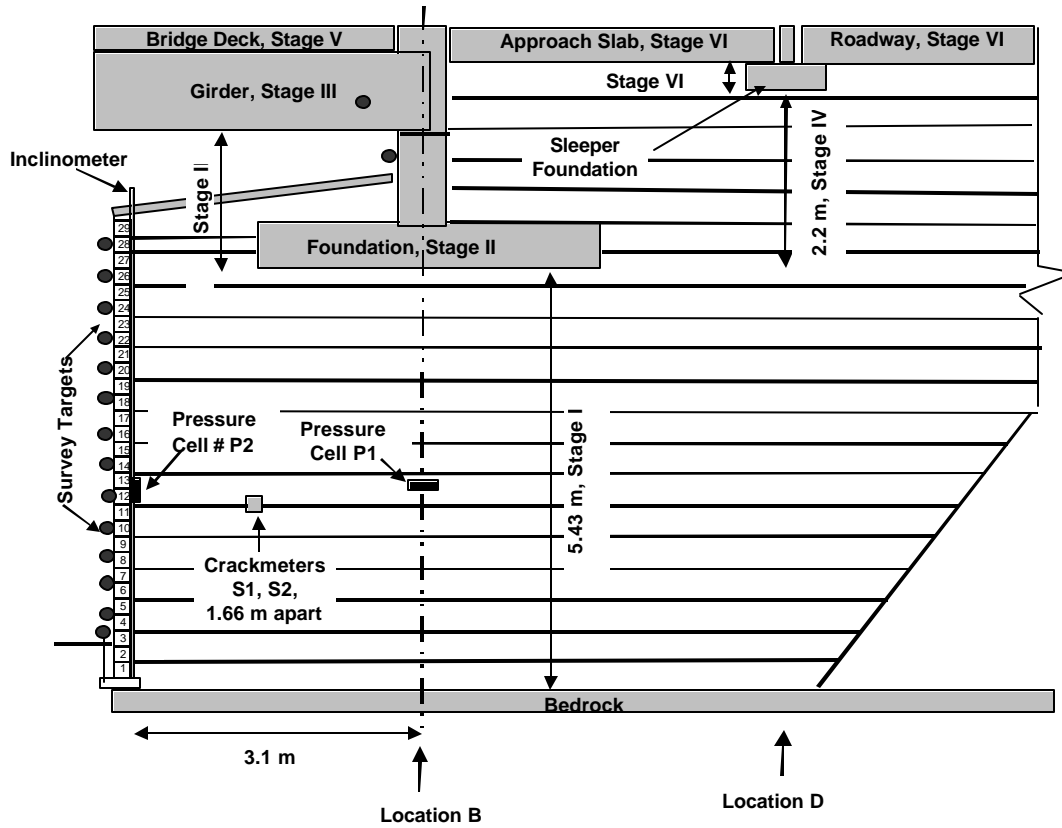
Instrumented Section 400 Indicating Construction Stages.
